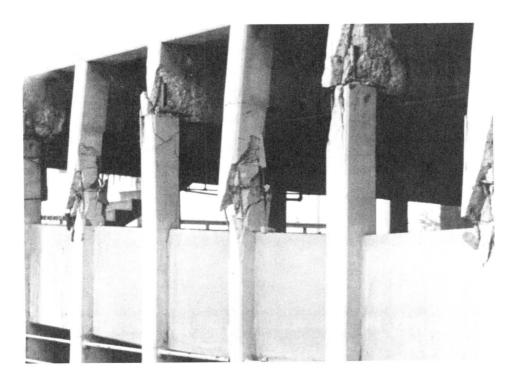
Close-up of the parking structure showing structural failure of the non-ductile concrete columns. *Photo by Ronald Gallagher*.
